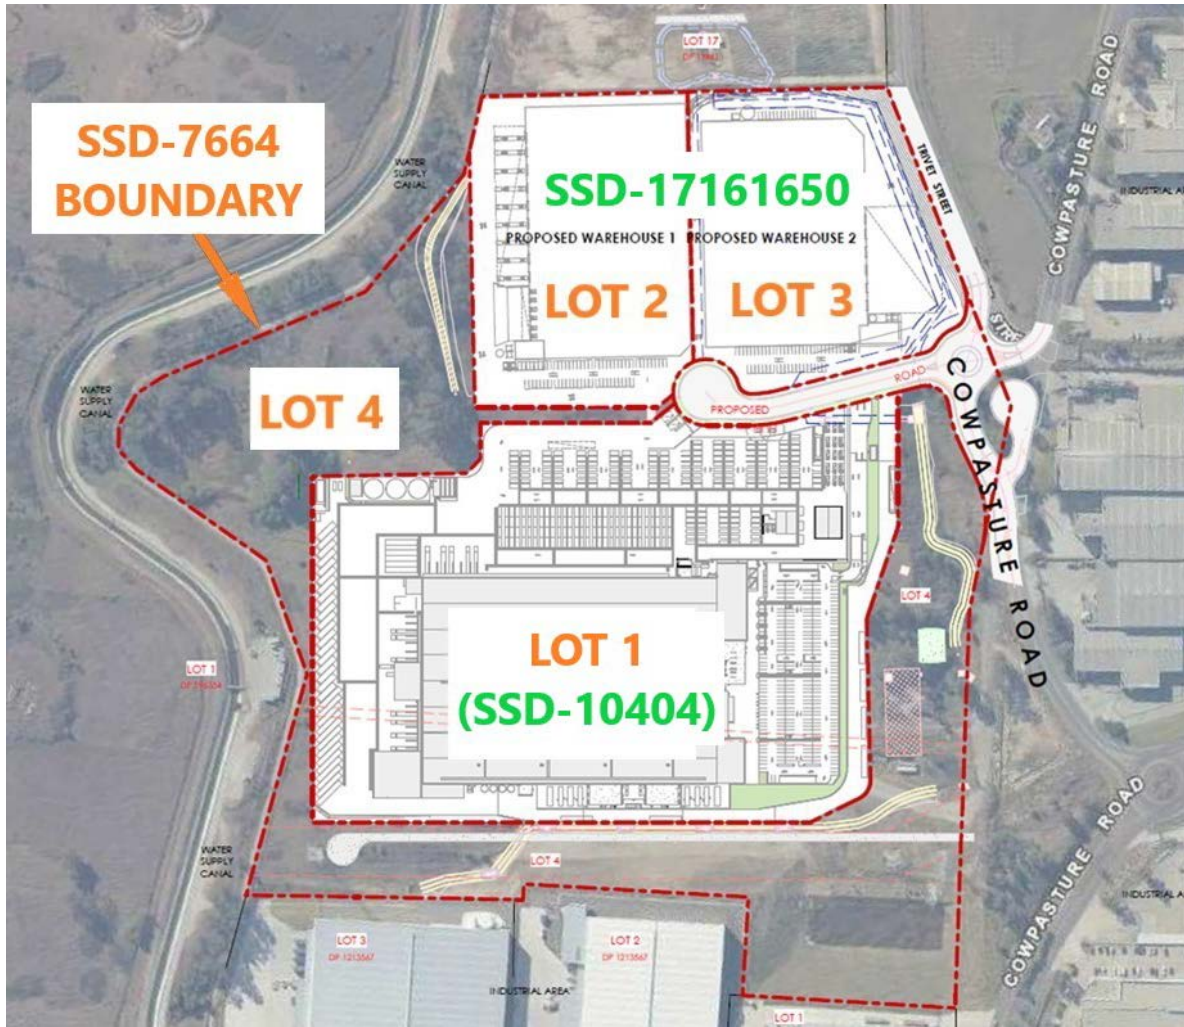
| SSD-7664-Mod-2 – Approved Development Site Layout Plan
